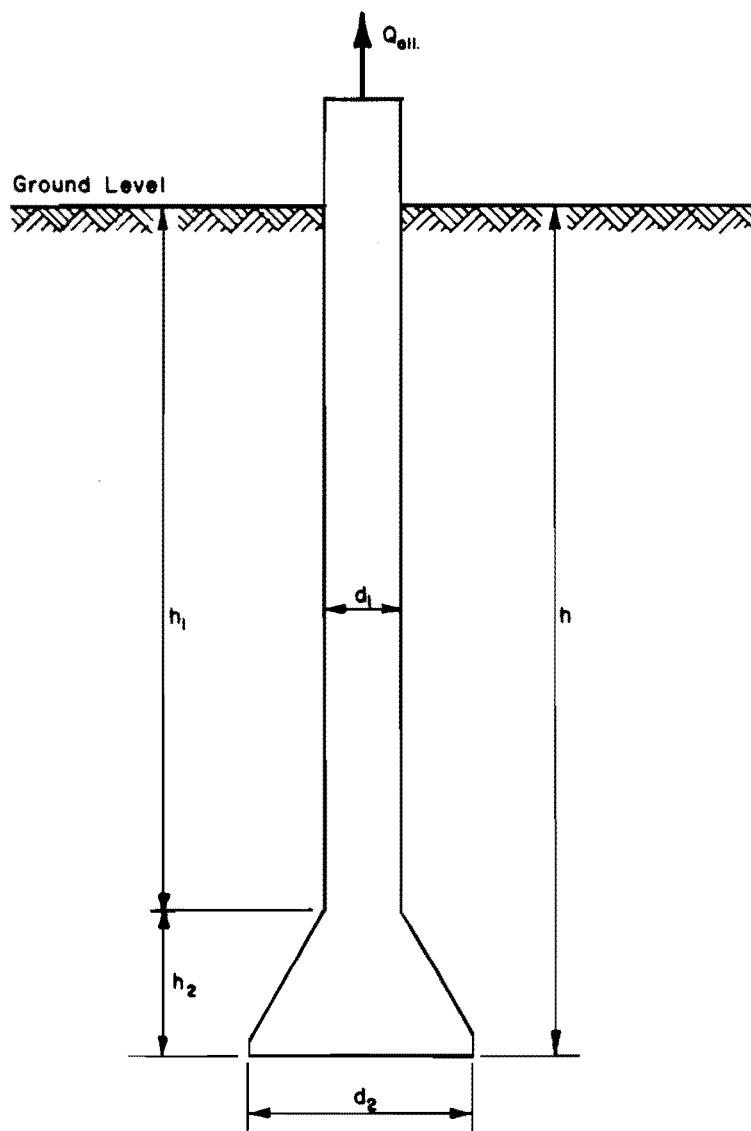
Dimensions of an anchor shaft as used in Eq 5.3.
